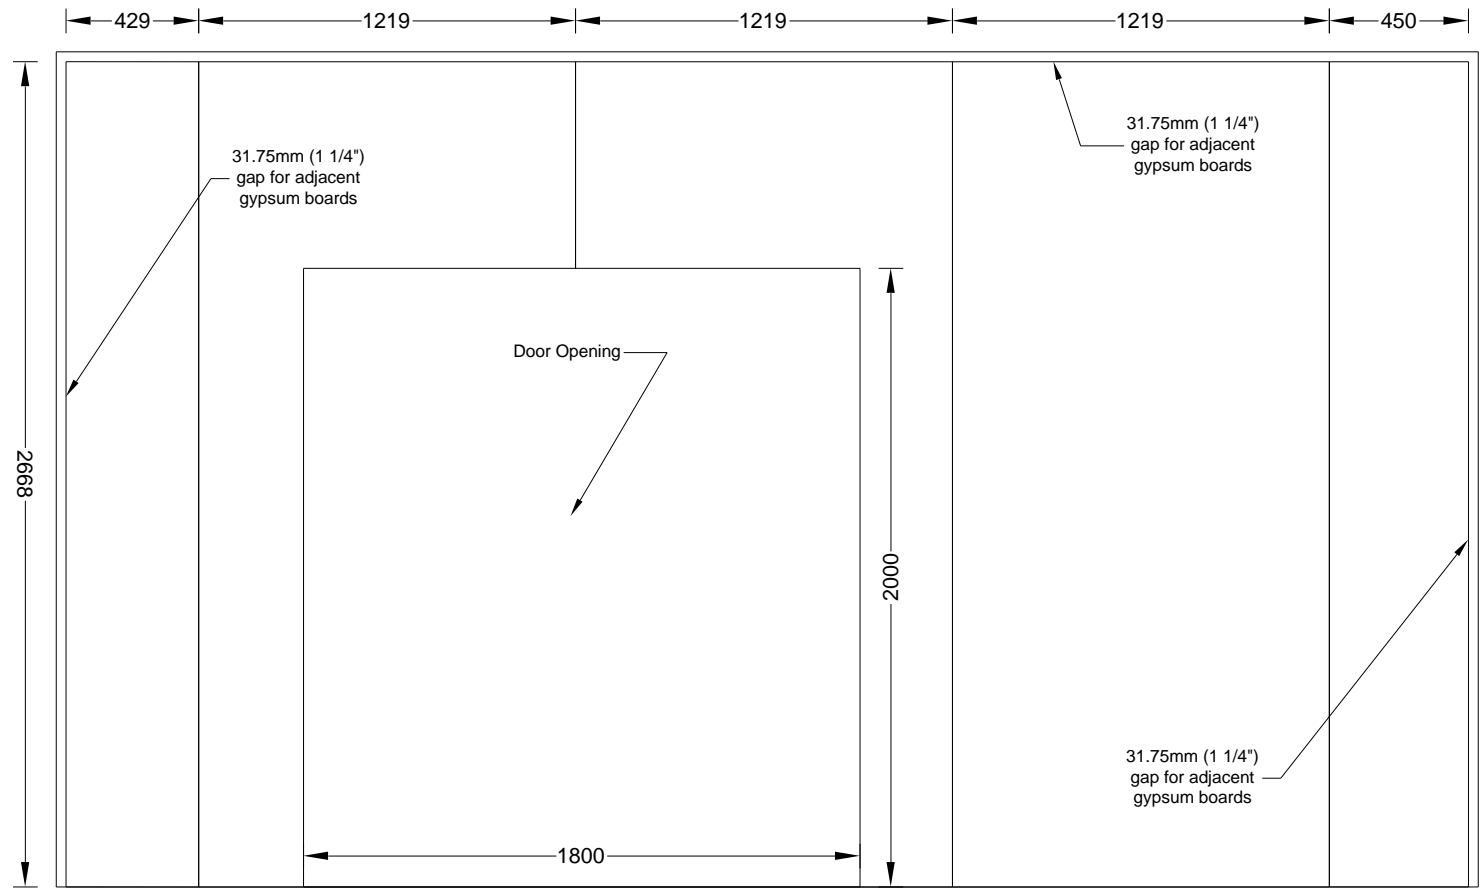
Test 1-1 Large Compartment CLT - W1 - Gypsum Layout - Face Layer
